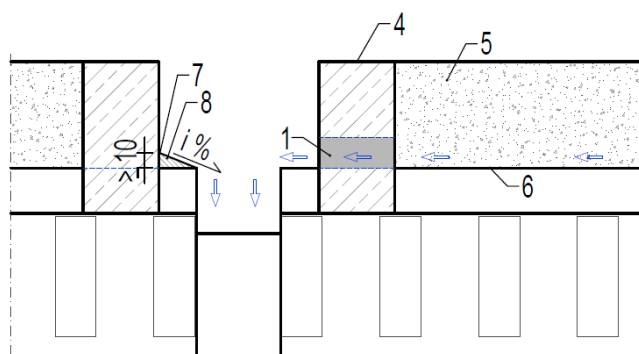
Perforation of the sub-ballast mat in the area where the backfill drainage is being carried out
